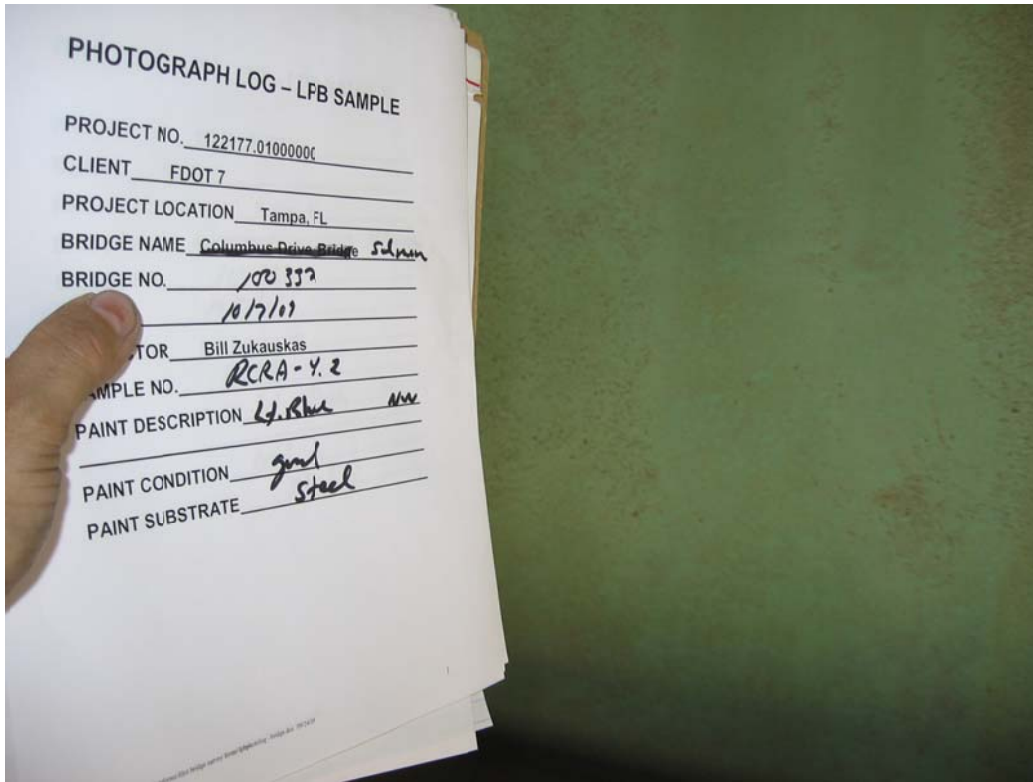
10/02/09 - SAMPLE RCRA-4.2
